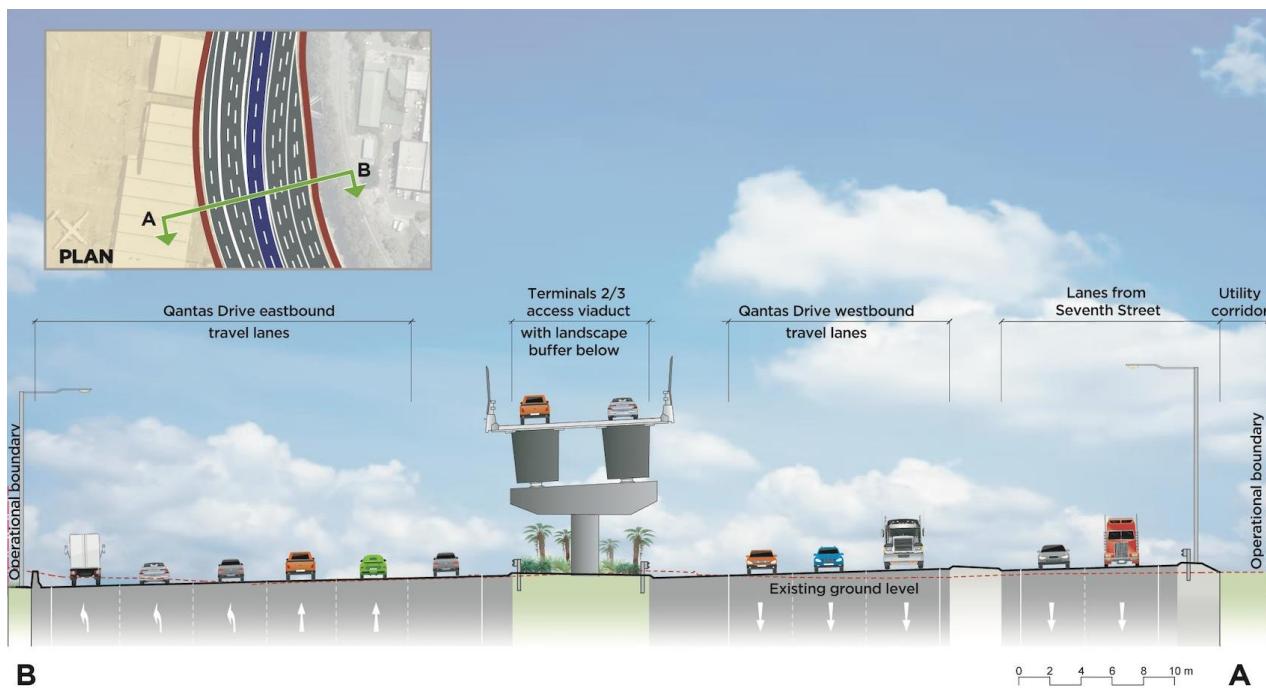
Qantas Drive upgrade and extension with Terminals 2/3 viaduct west of Robey Street – cross-section (looking south)
